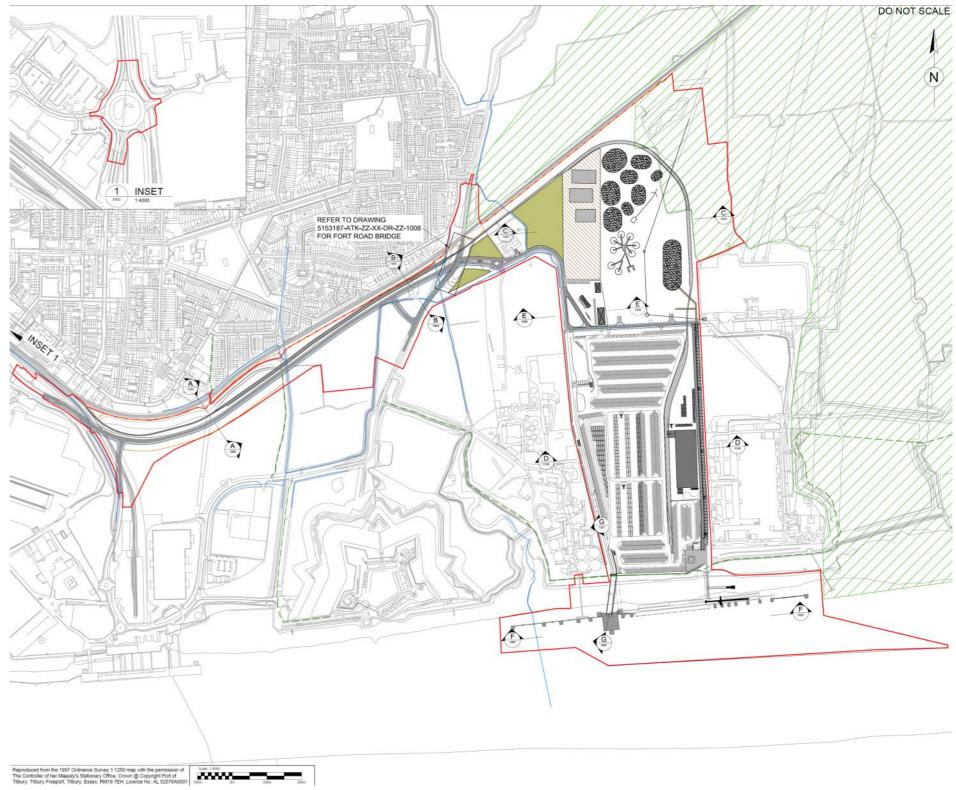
General Arrangement plan of the main Tilbury2 Site (Sheet 1 of 2) (Source: Atkins)
